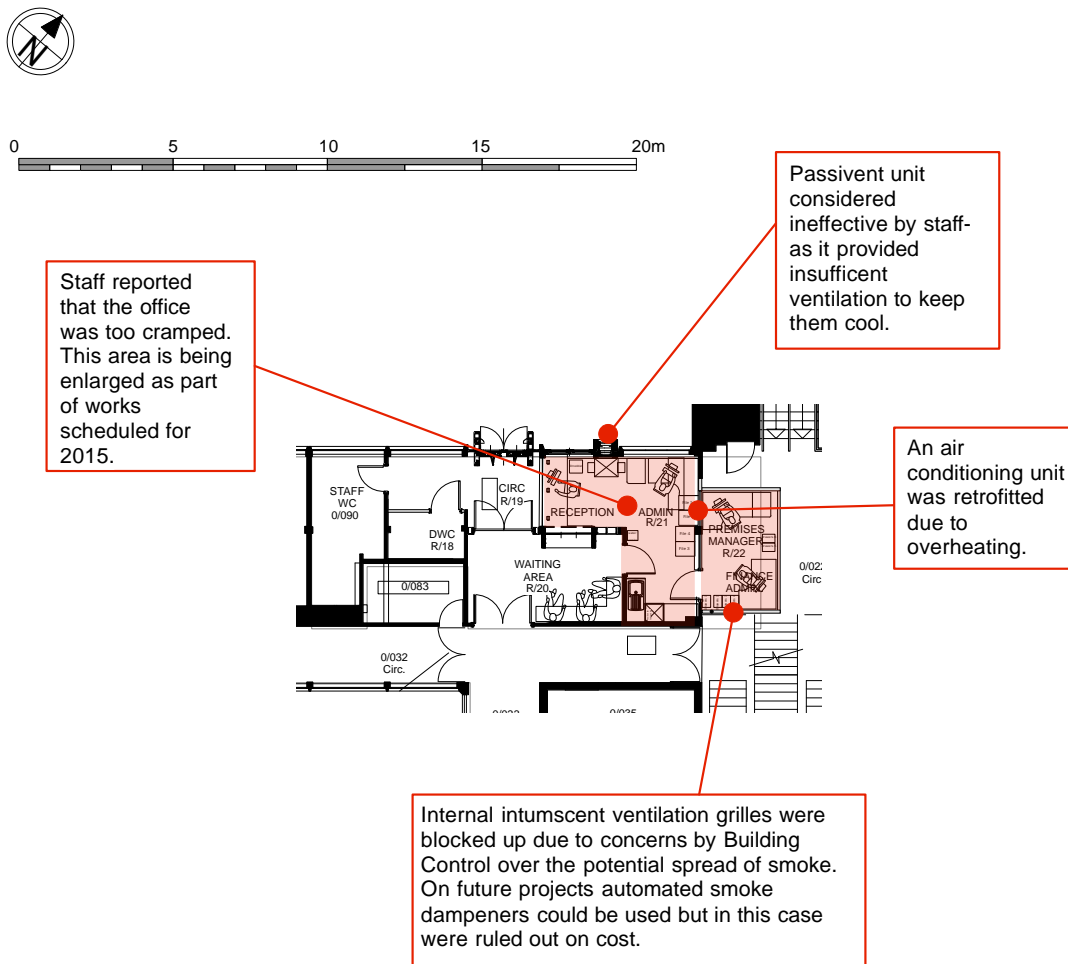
Extract plan from the Ground Floor of the Old Building Reception area.
